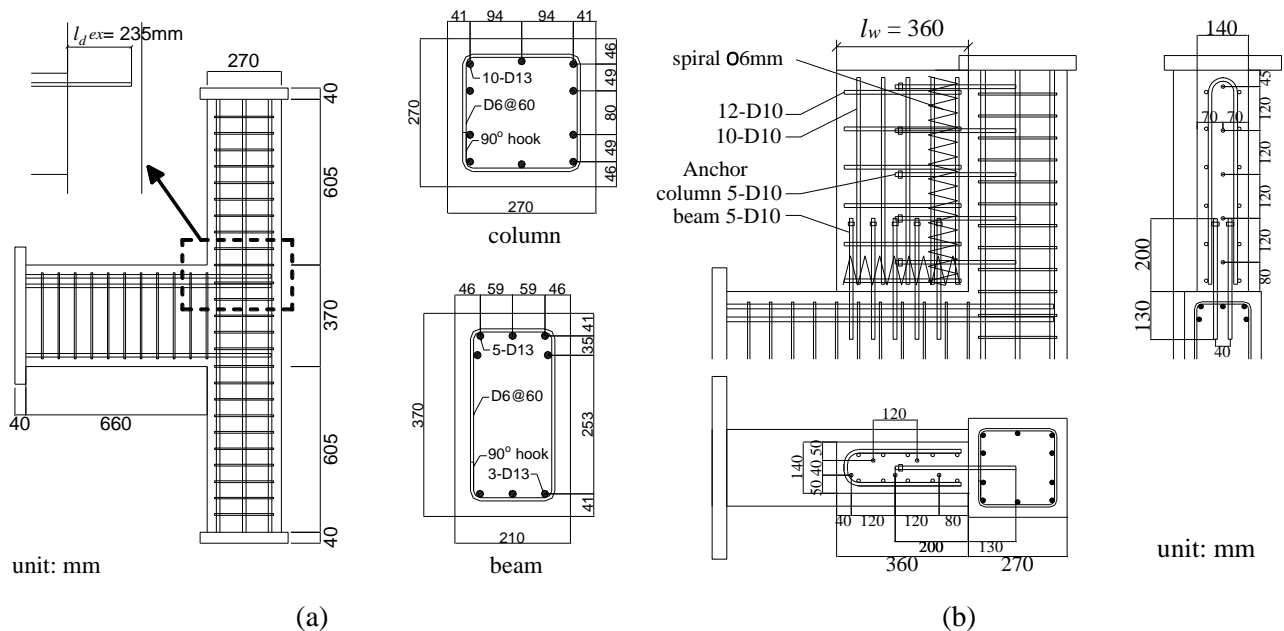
Details of specimen: (a) benchmark specimen, J1; (b) strengthened specimen, J1-W [2]
